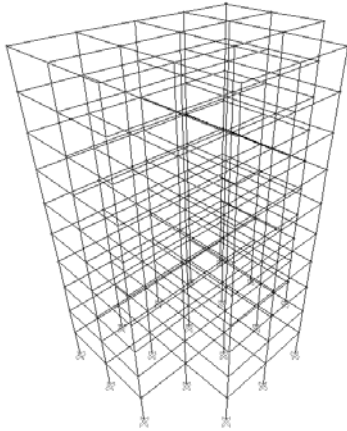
SAP2000 model (skeletal view) of the sample building.
